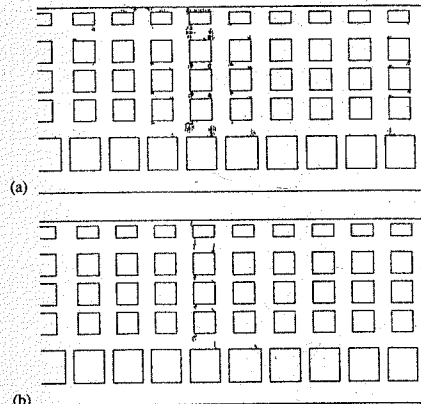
Crack pattern (a) and fully open cracks (b) for the anchored façade.
